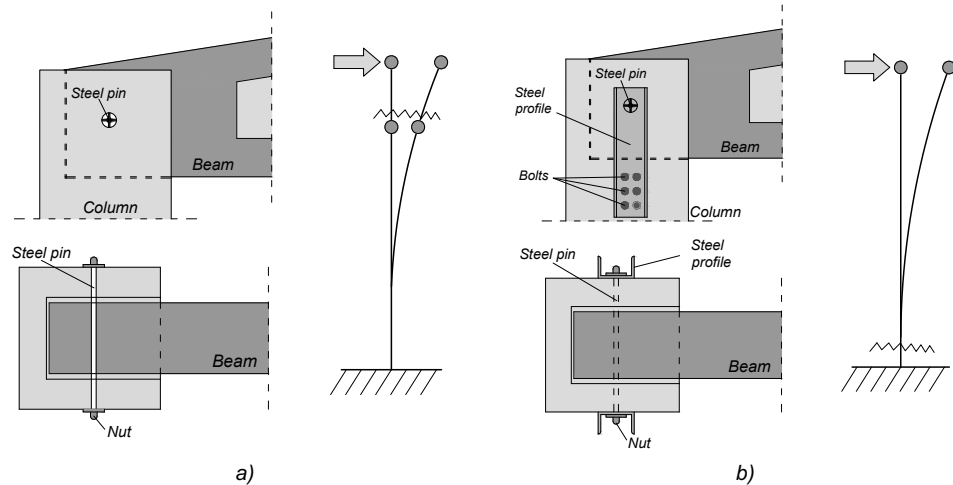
a) Structural model with the unreinforced fork; b) structural model with the reinforced fork with two lateral UPN 200 steel profiles.
